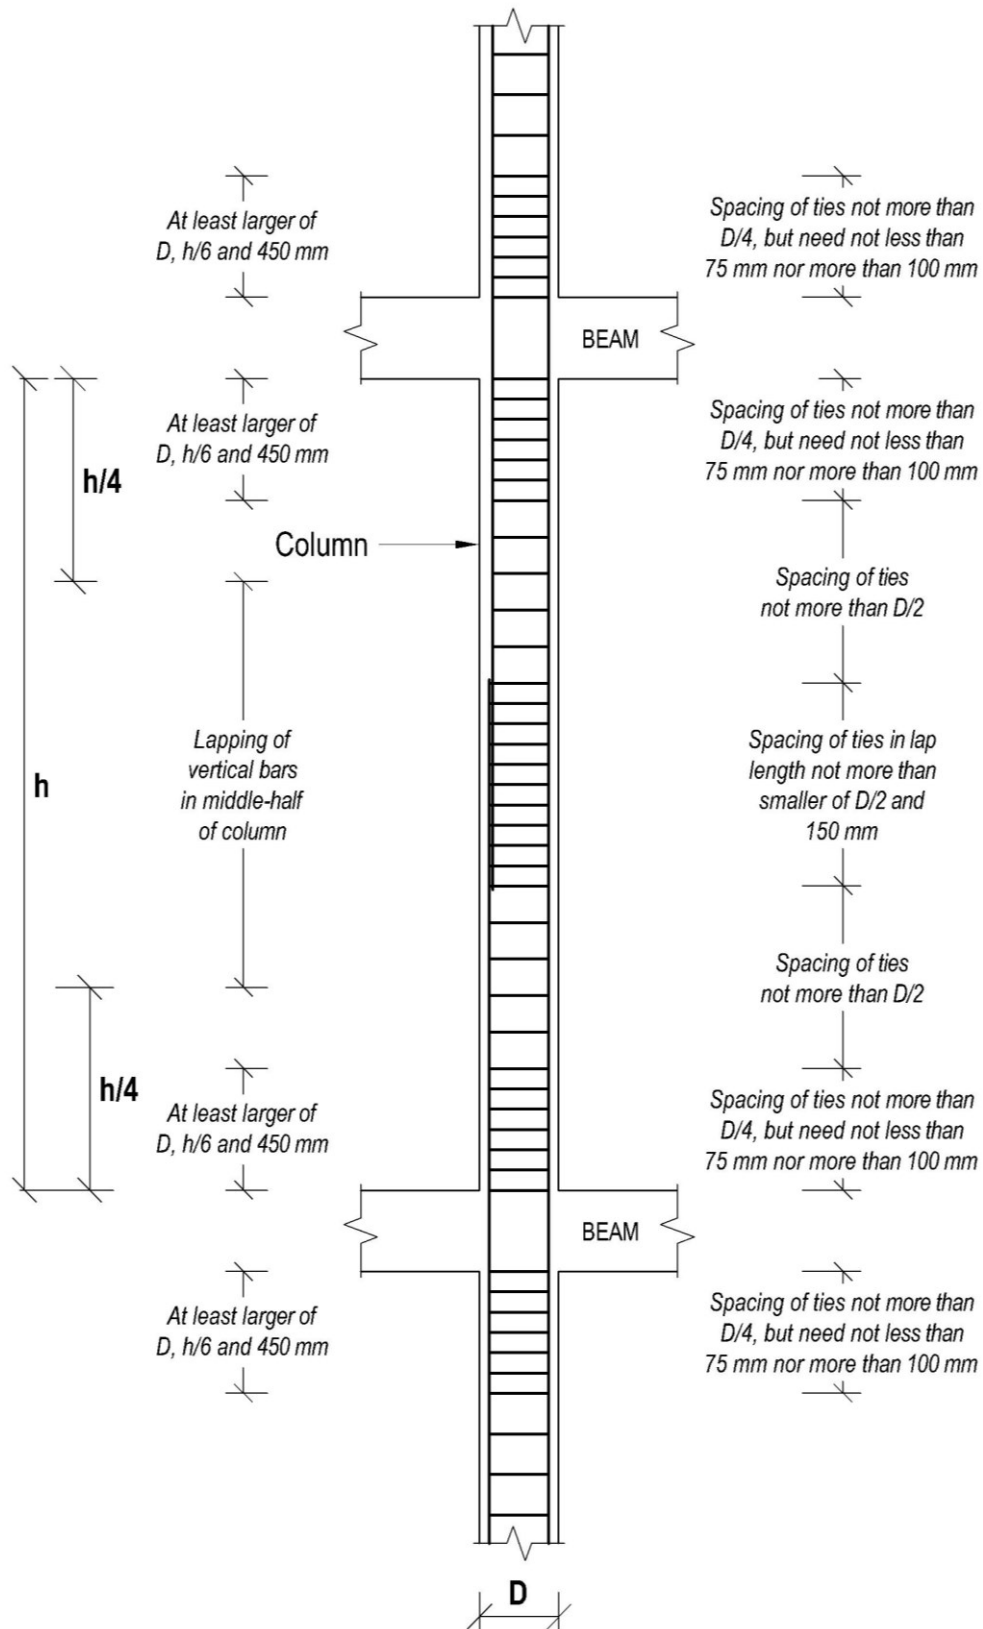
Placing vertical bars and closed ties in columns (Murty, 2005)
